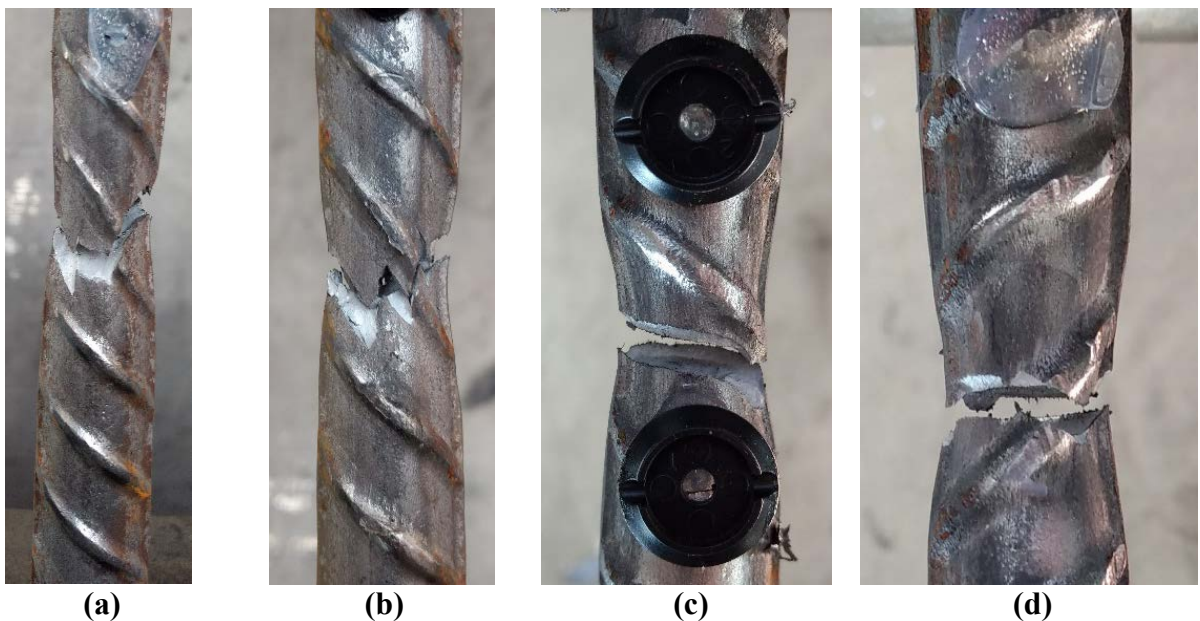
(a), (b) *Ductile fracture surface of Mill 3 rebar; (c), (d) Ductile fracture surface of Mill 1 rebar
